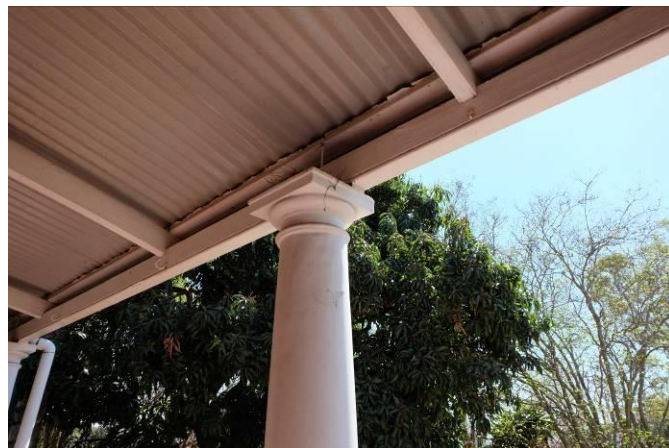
\_ Columns support Verandah roofing with wooden trusses
